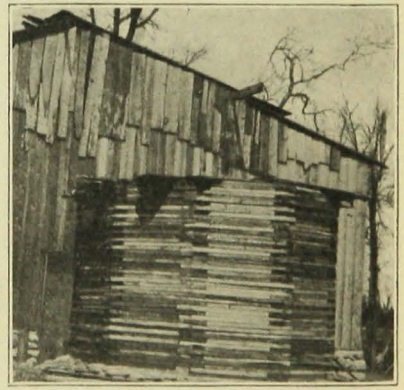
Silo 8 Feet in the Ground and 8 Feet Above
